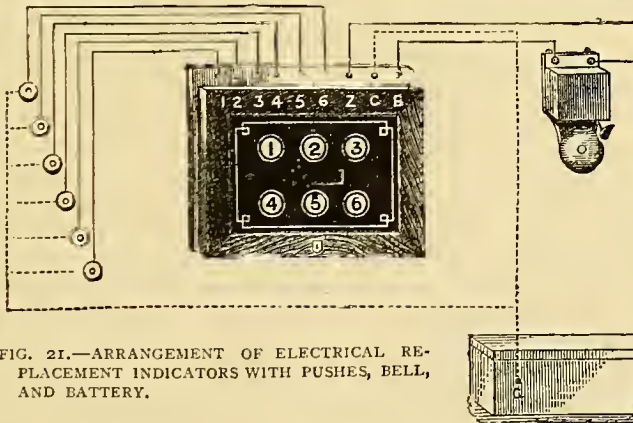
ARRANGEMENT OF ELECTRICAL REPLACEMENT INDICATORS WITH PUSHES, BELL, AND BATTERY.
